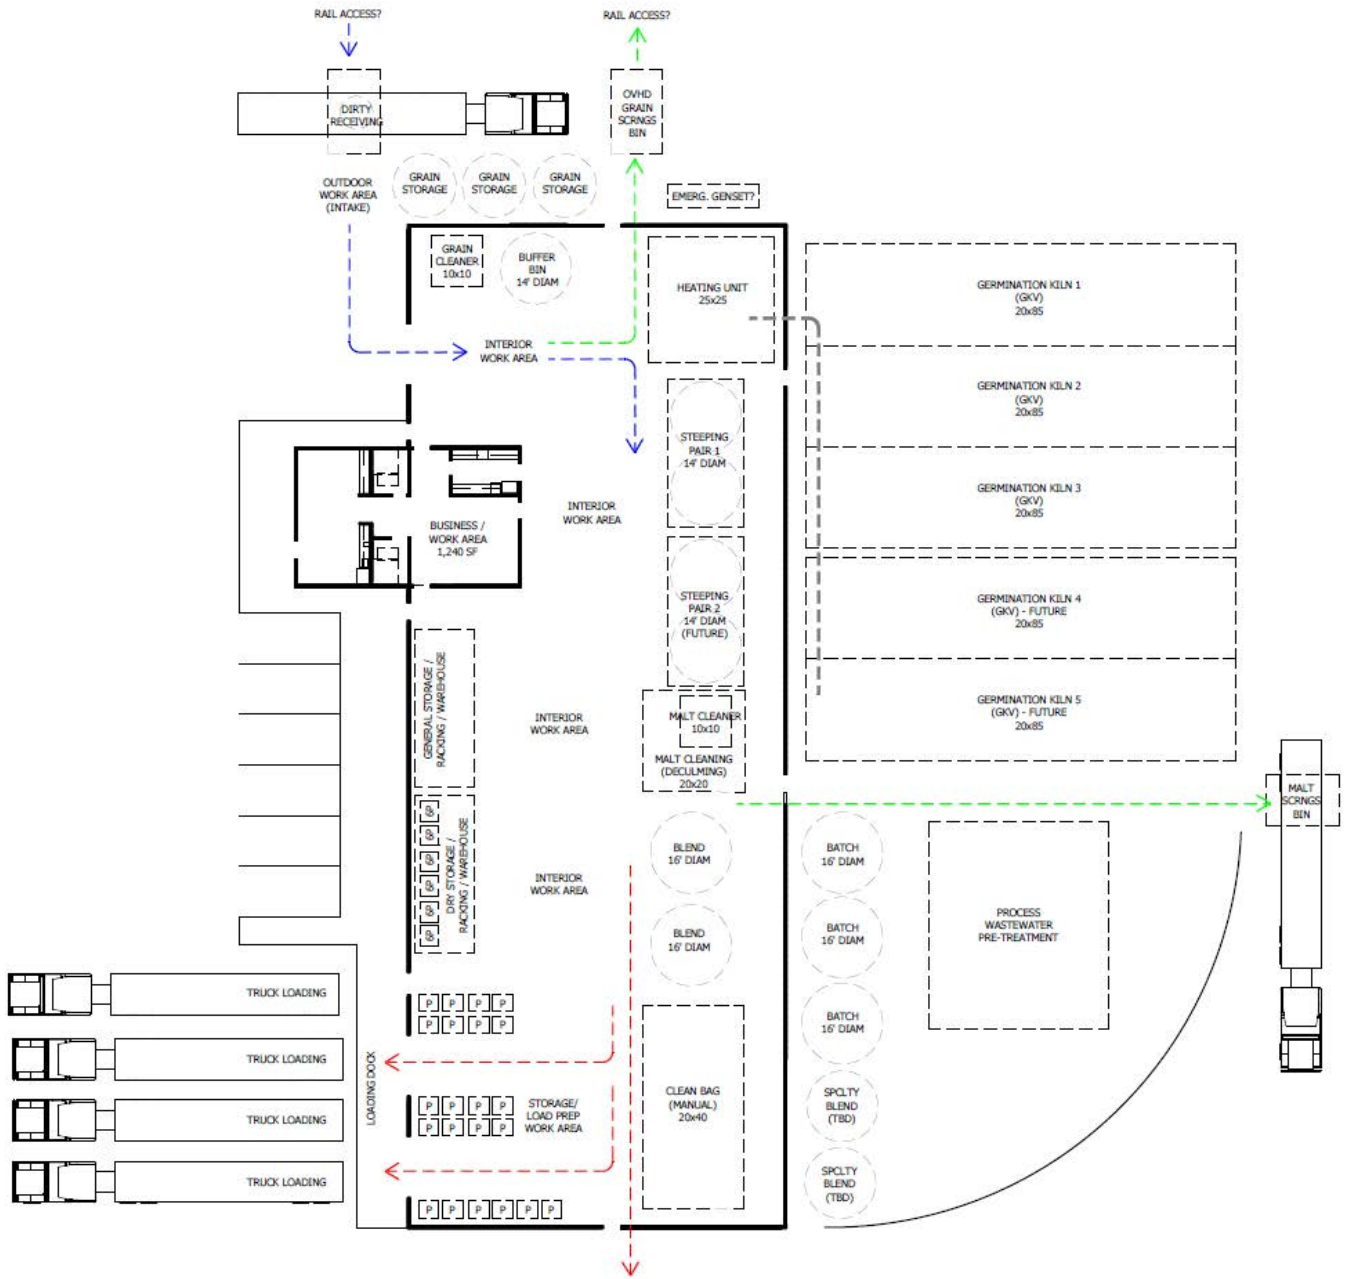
| Preliminary craft malthouse concept floor plan for an expanded, 15,000 square foot facility.
